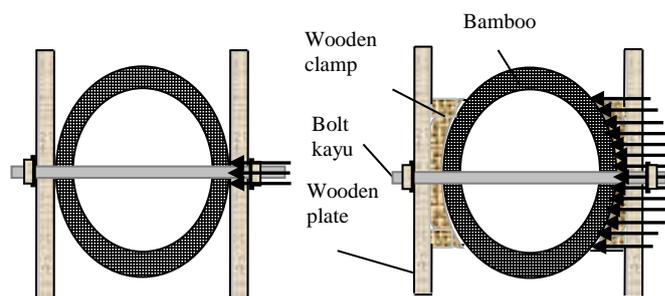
Forces distribution from bolt and wooden plate to bamboo stem; (a) direct force to bamboo stem (b) forces acting through wooden clamp.
